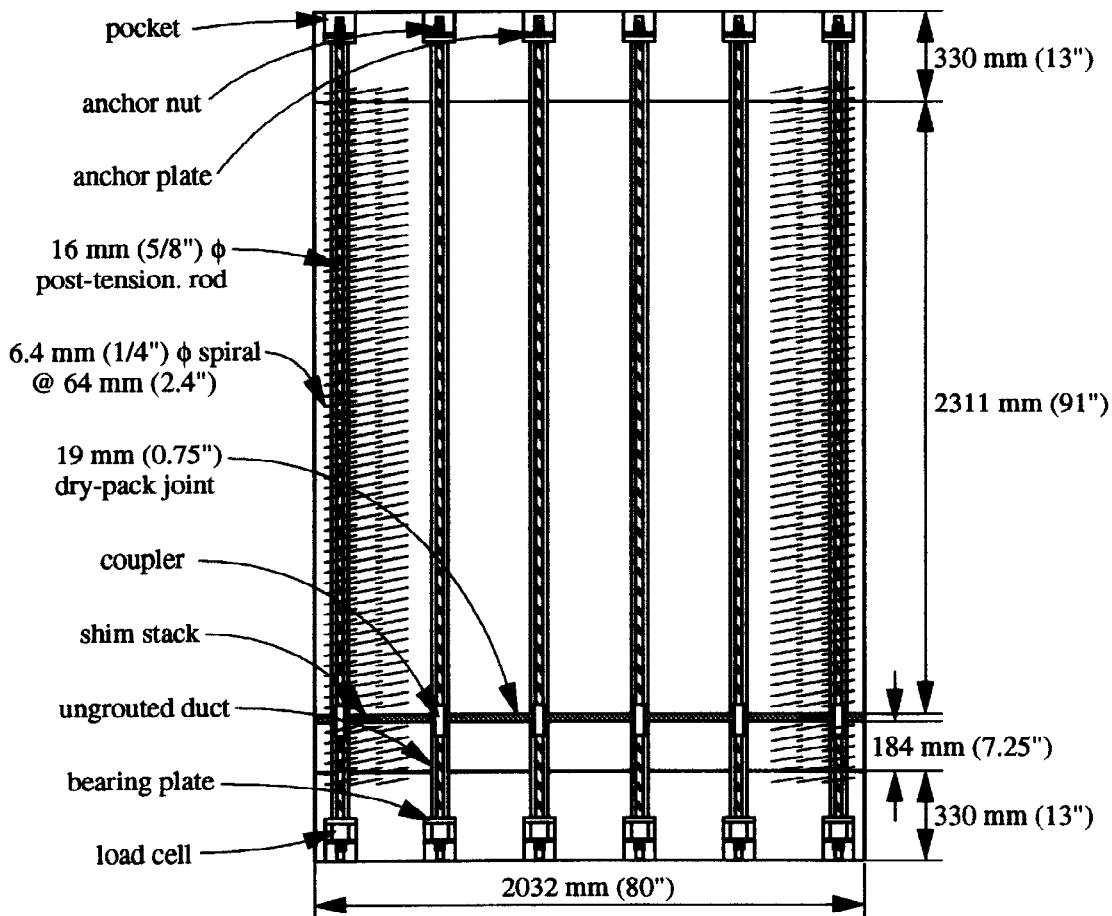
Post-tensioned tendon (PTT) specimen detail
